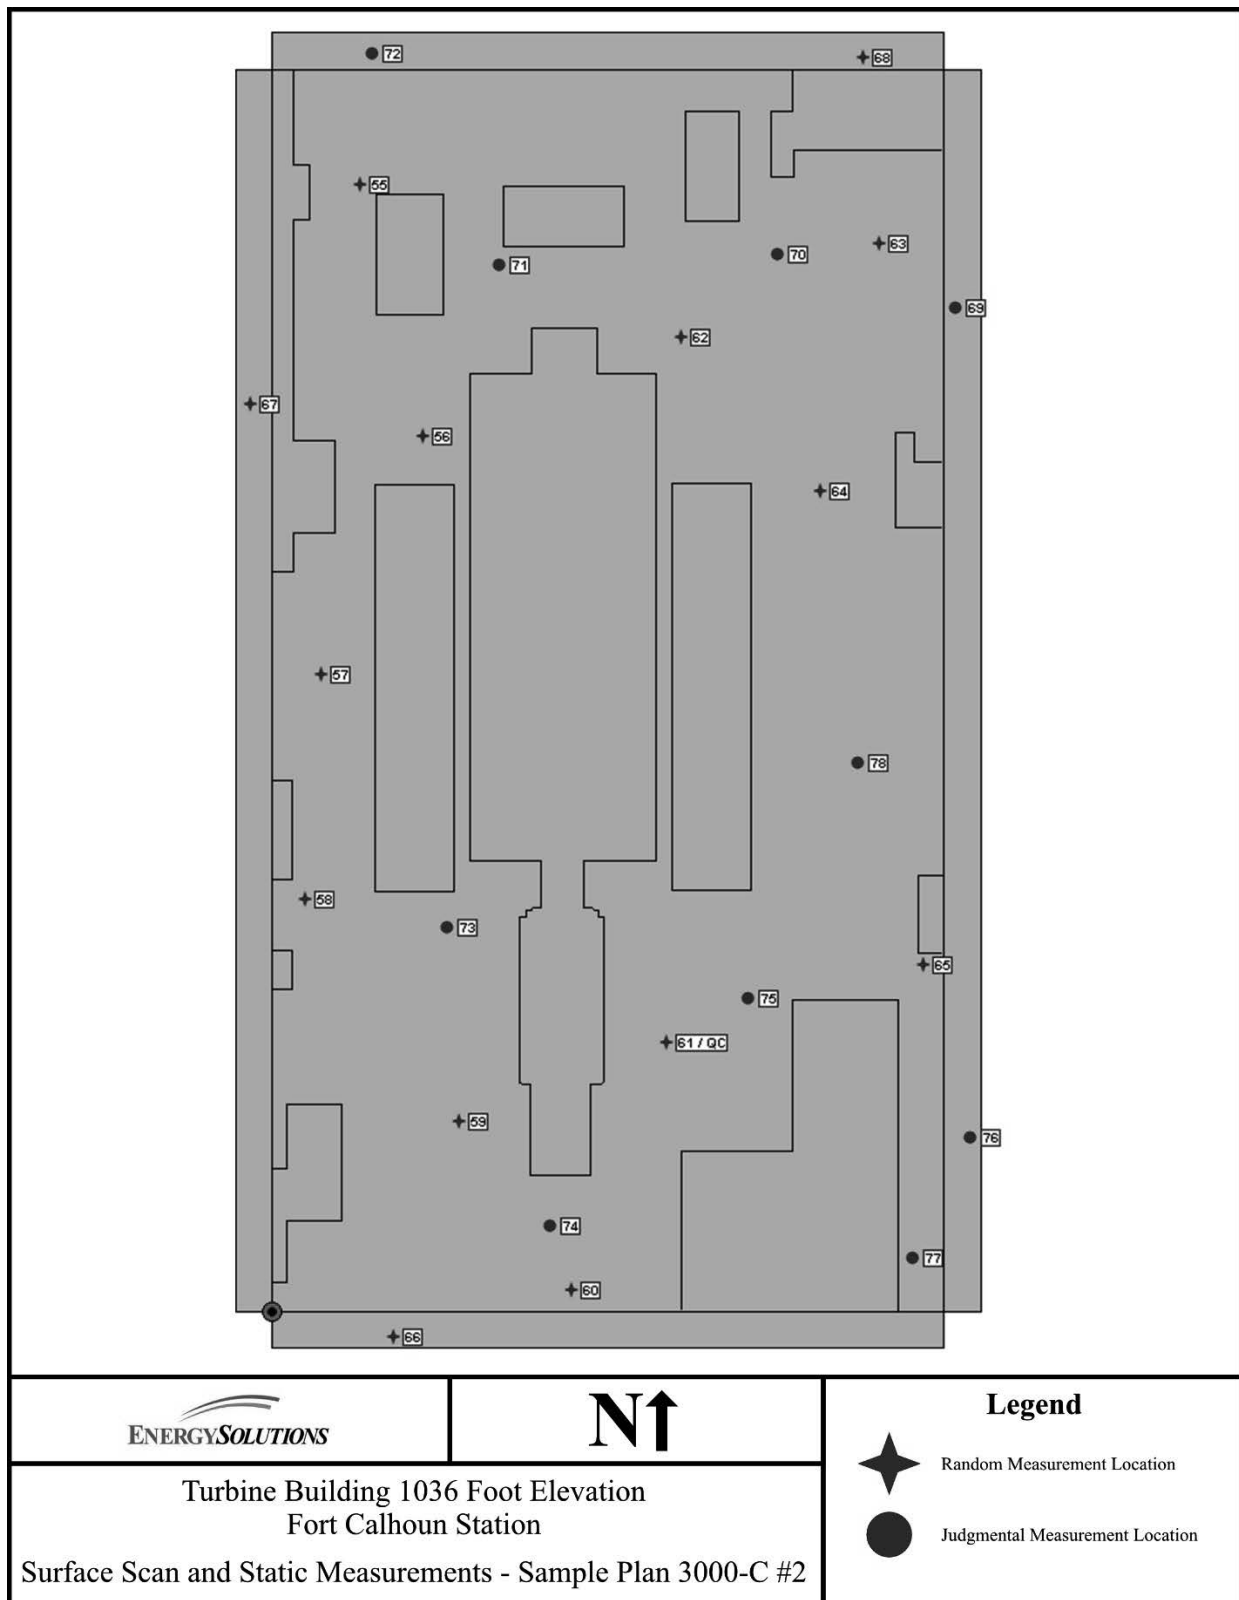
Turbine Building 1036 Foot Elevation Surface Measurement Locations
